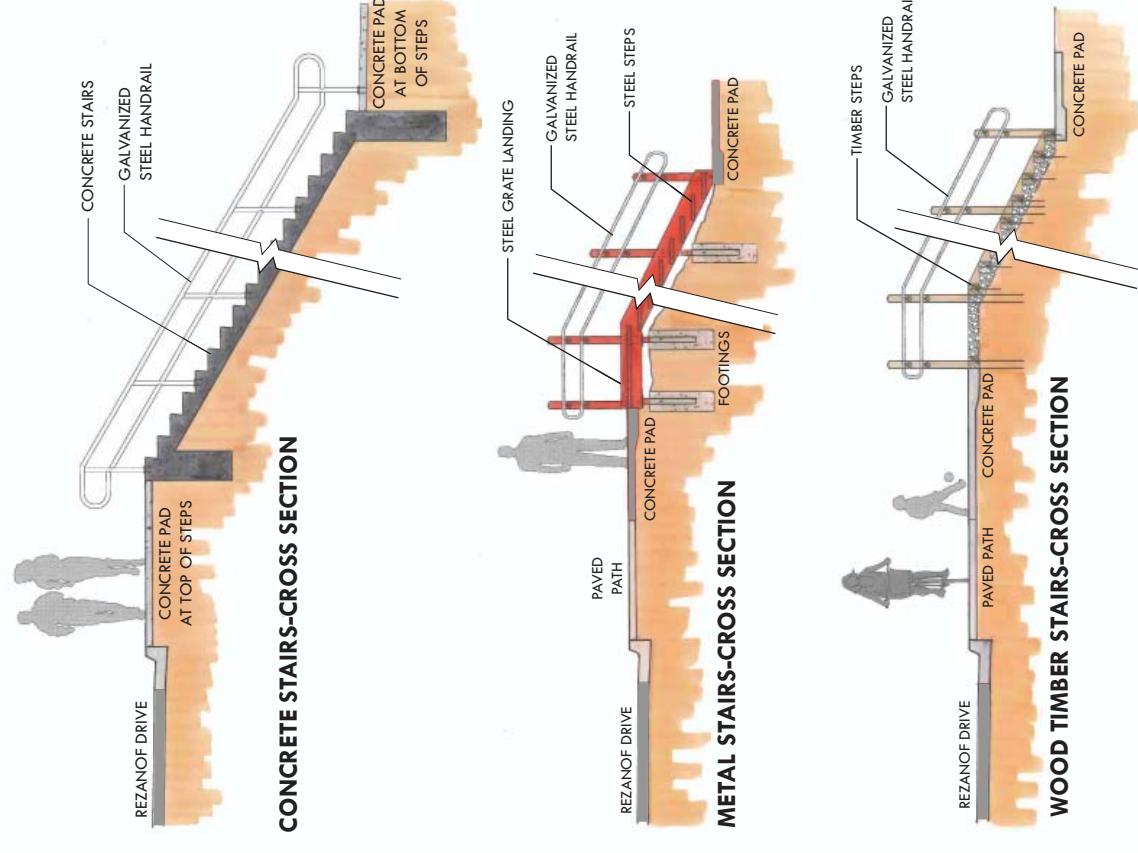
Sections of potential stair types including concrete, metal, and wood. Given the steep existing slope the concrete and wood stairs would require additional fill. The B1-B project design and construction cost estimate is based on an estimate completed in 2004 for a metal stair design.
